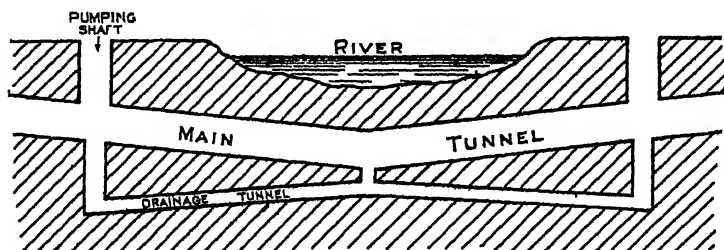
TYPICAL RIVER TUNNEL—OLD PLAN.
